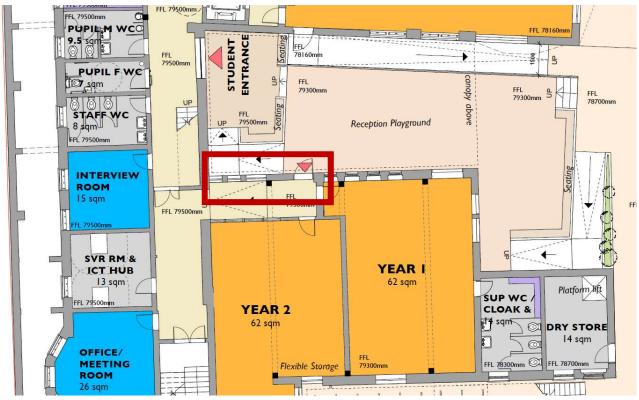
Snapshot showing the proposed new wall (new thermal element).
